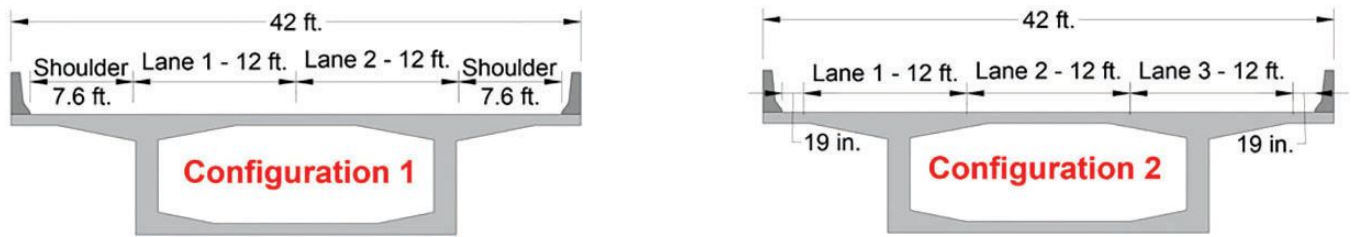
Lane configurations for a box-girder cross section of a concrete segmental bridge: (a) two-lane striped configuration; (b) three-lane design configuration.²
